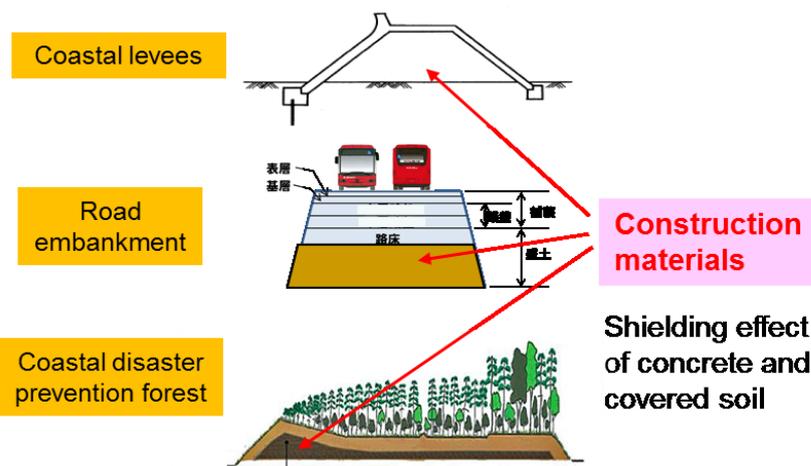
EXAMPLES OF CIVIL ENGINEERING STRUCTURES FOR RECYCLING DECONTAMINATION SOIL.
